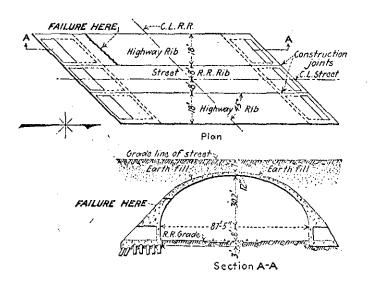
Sketch showing crack in Tacoma, Washington Bridge (39)
